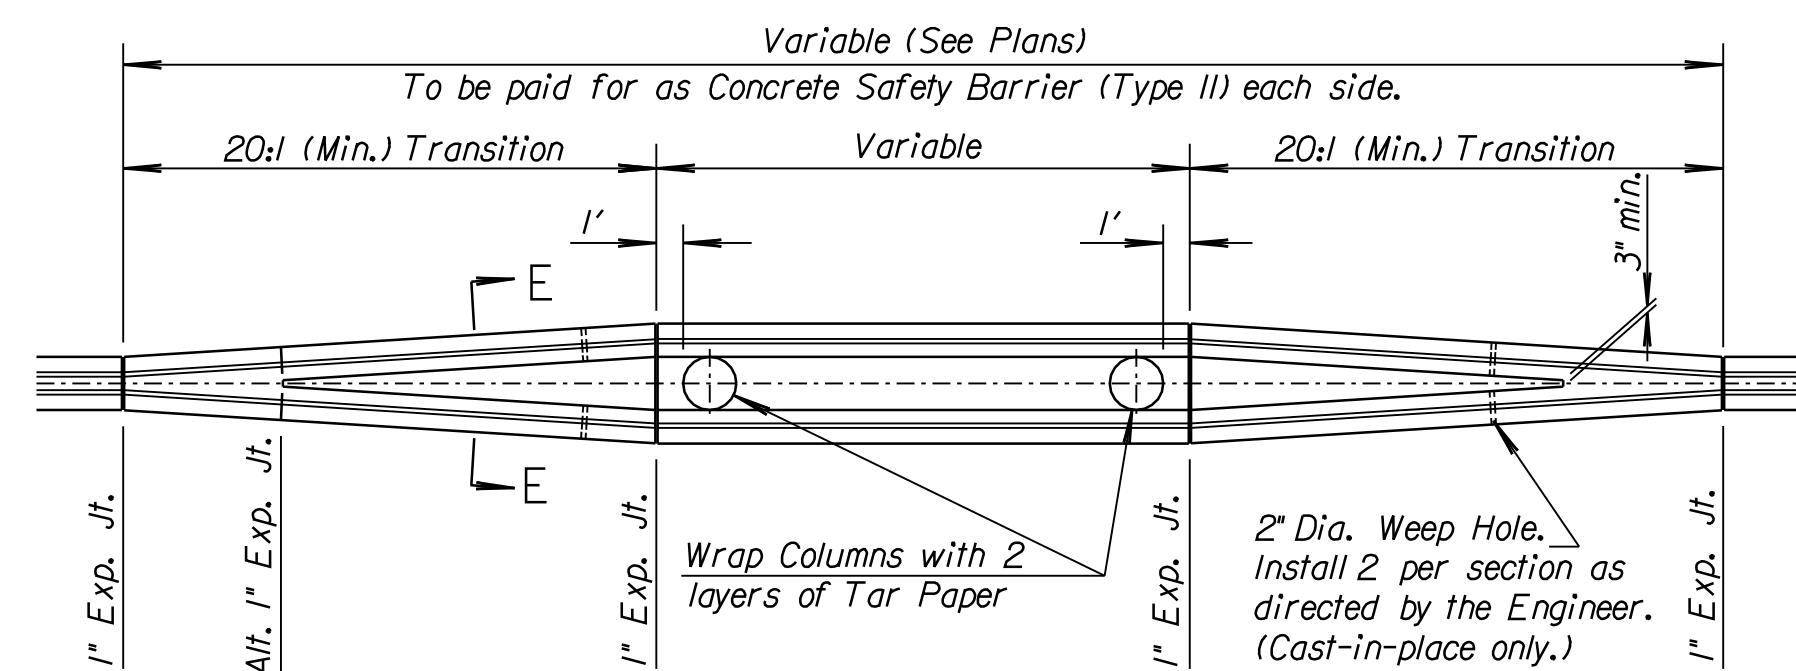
DETAIL FOR BRIDGE WITH SAFETY TYPE RAIL
